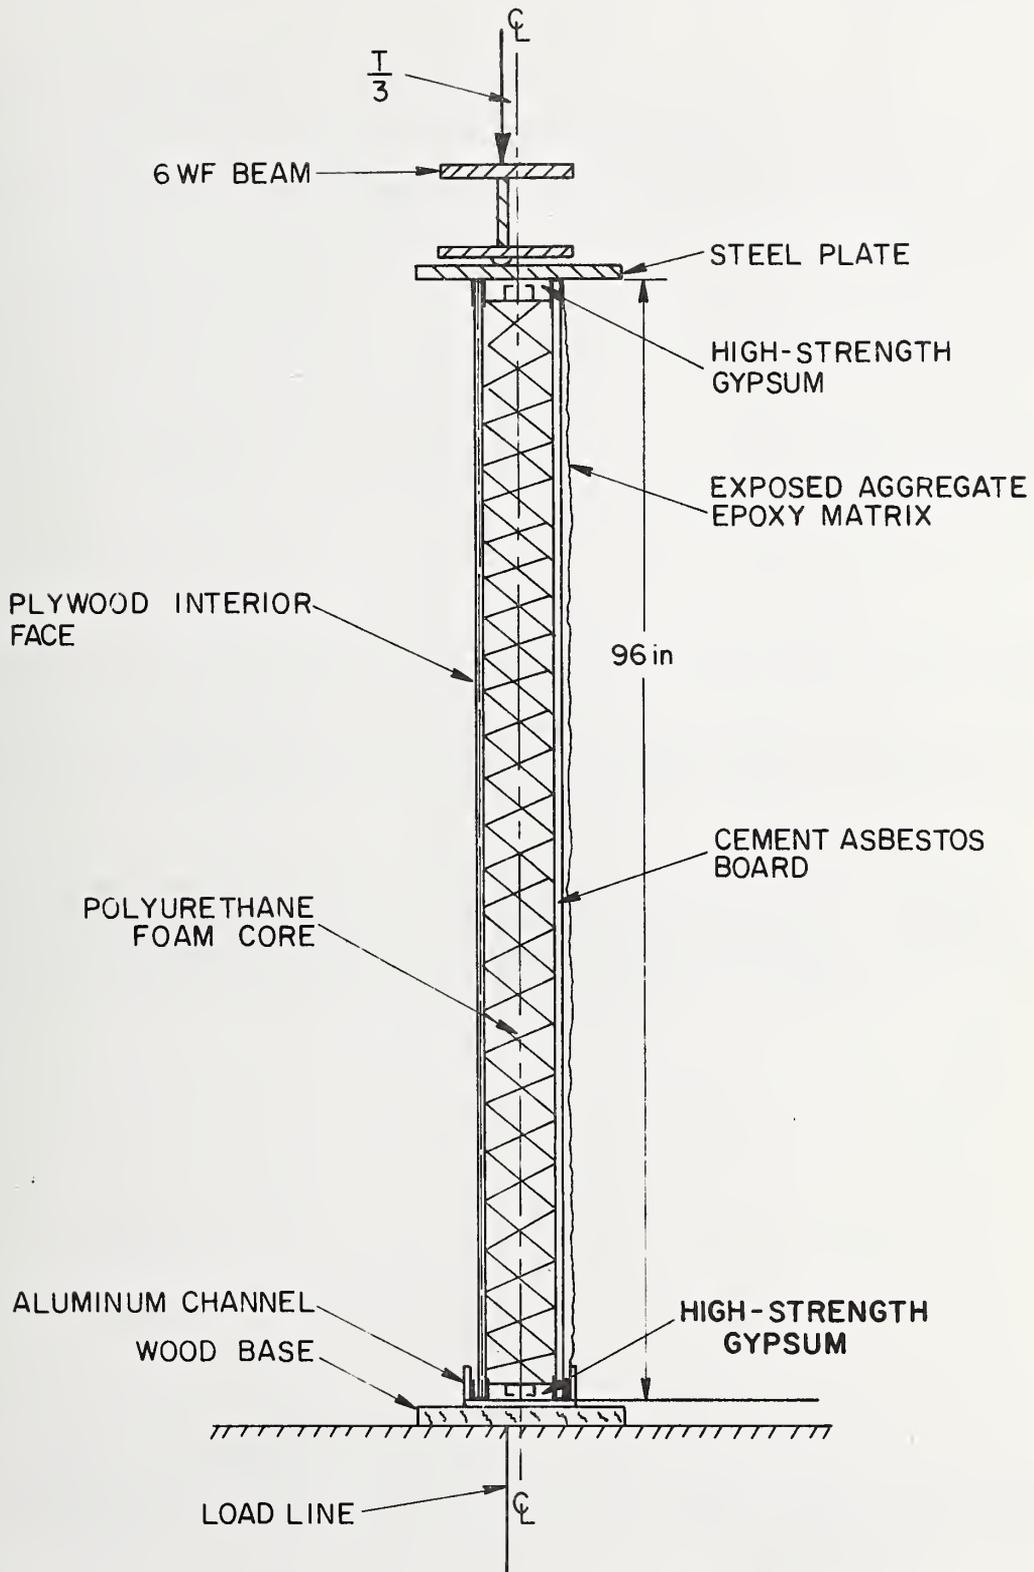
SCHEMATIC FOR SHORT-TERM COMPRESSION TEST ON FULL SIZE WALL PANEL
